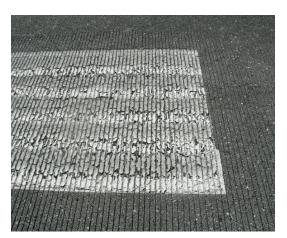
A PRE-EXISTING CONDITION OF POOR ASPHALT PAVEMENT.
